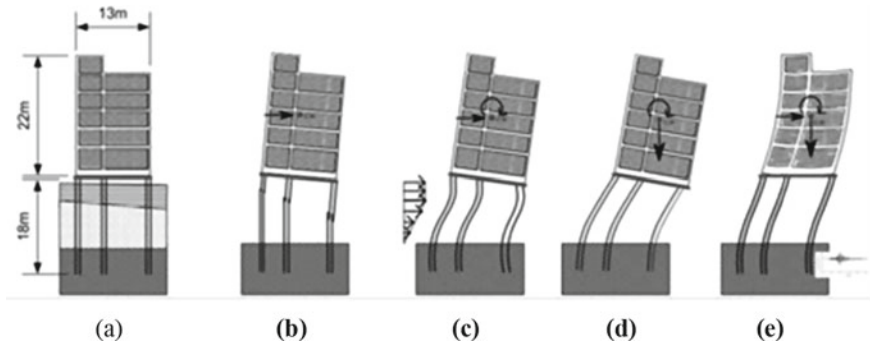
Various failure mechanisms of pile, a Kandla Port building with foundation, b shear failure, c bending failure, d buckling failure, and e dynamic amplification [19]
